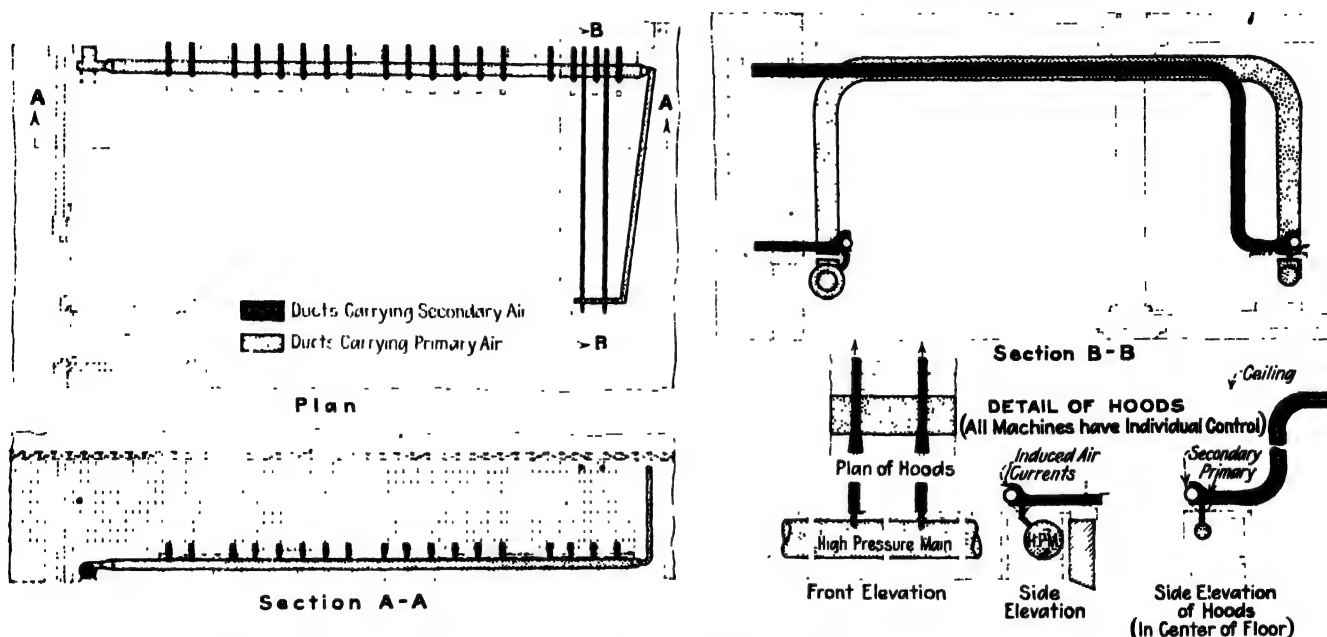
PLAN, ELEVATION AND SECTIONS OF NEW SATIN-FINISHING DEPARTMENT, SHOWING THE PRIMARY AND SECONDARY AIR DUCTS
